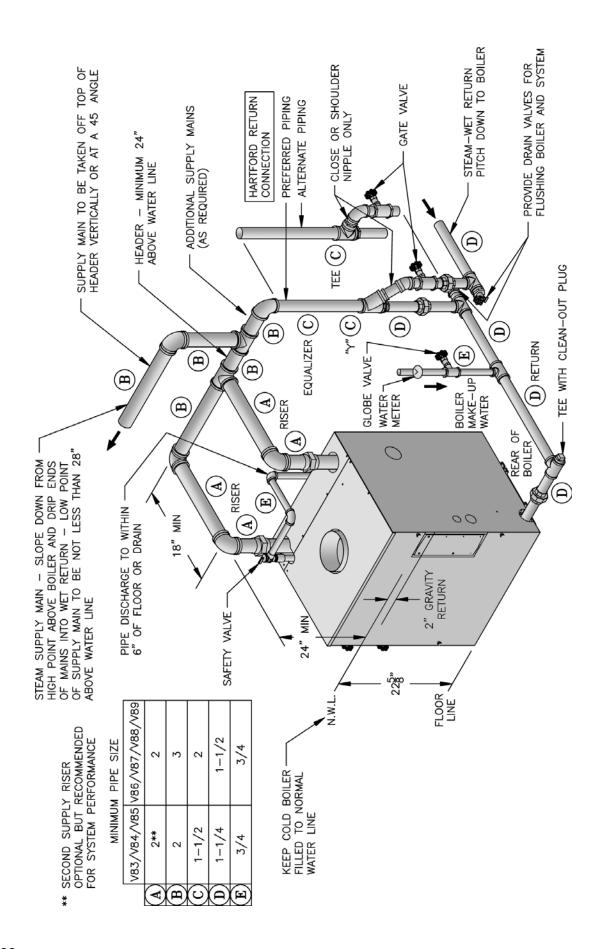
V83 Thru V89 Recommended Boiler Piping For Gravity Return Steam Boiler
